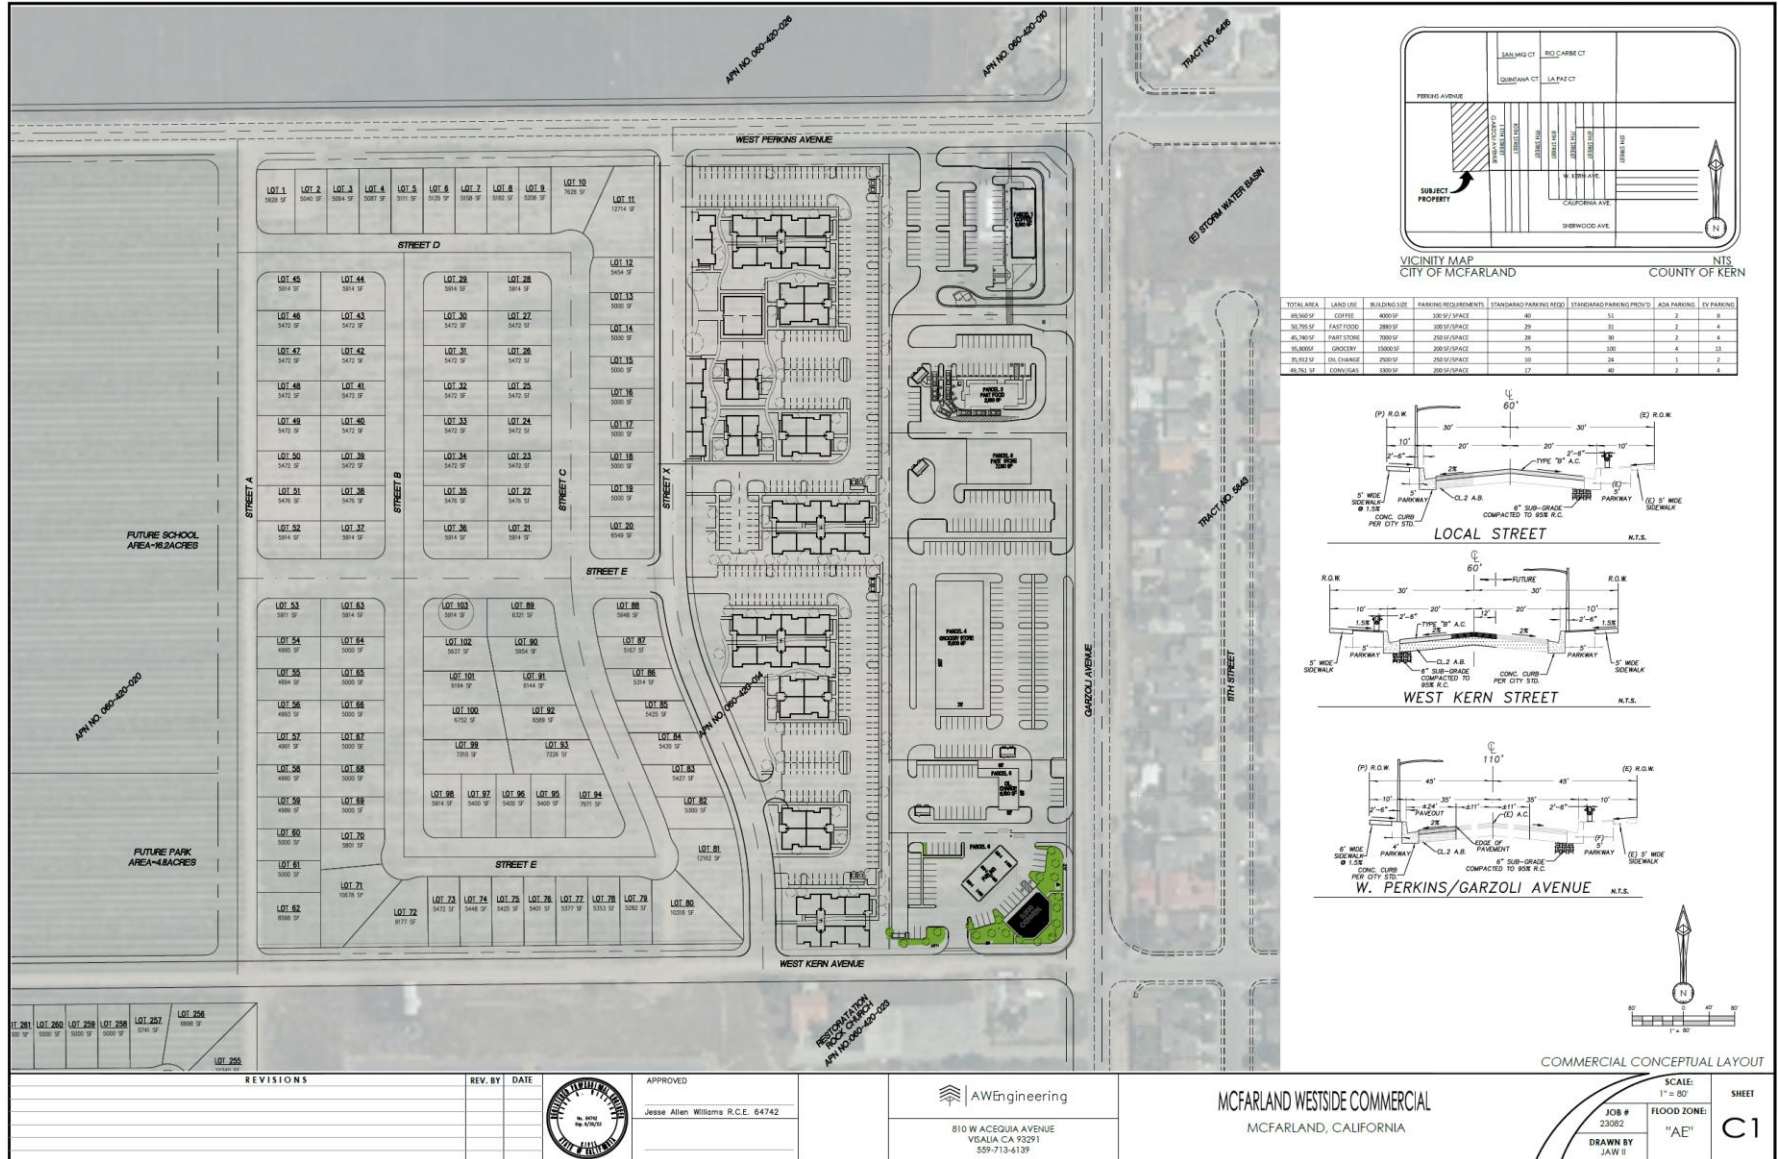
Details of Square Footage and Parking in Commercial Area of Annexation #19 Area
